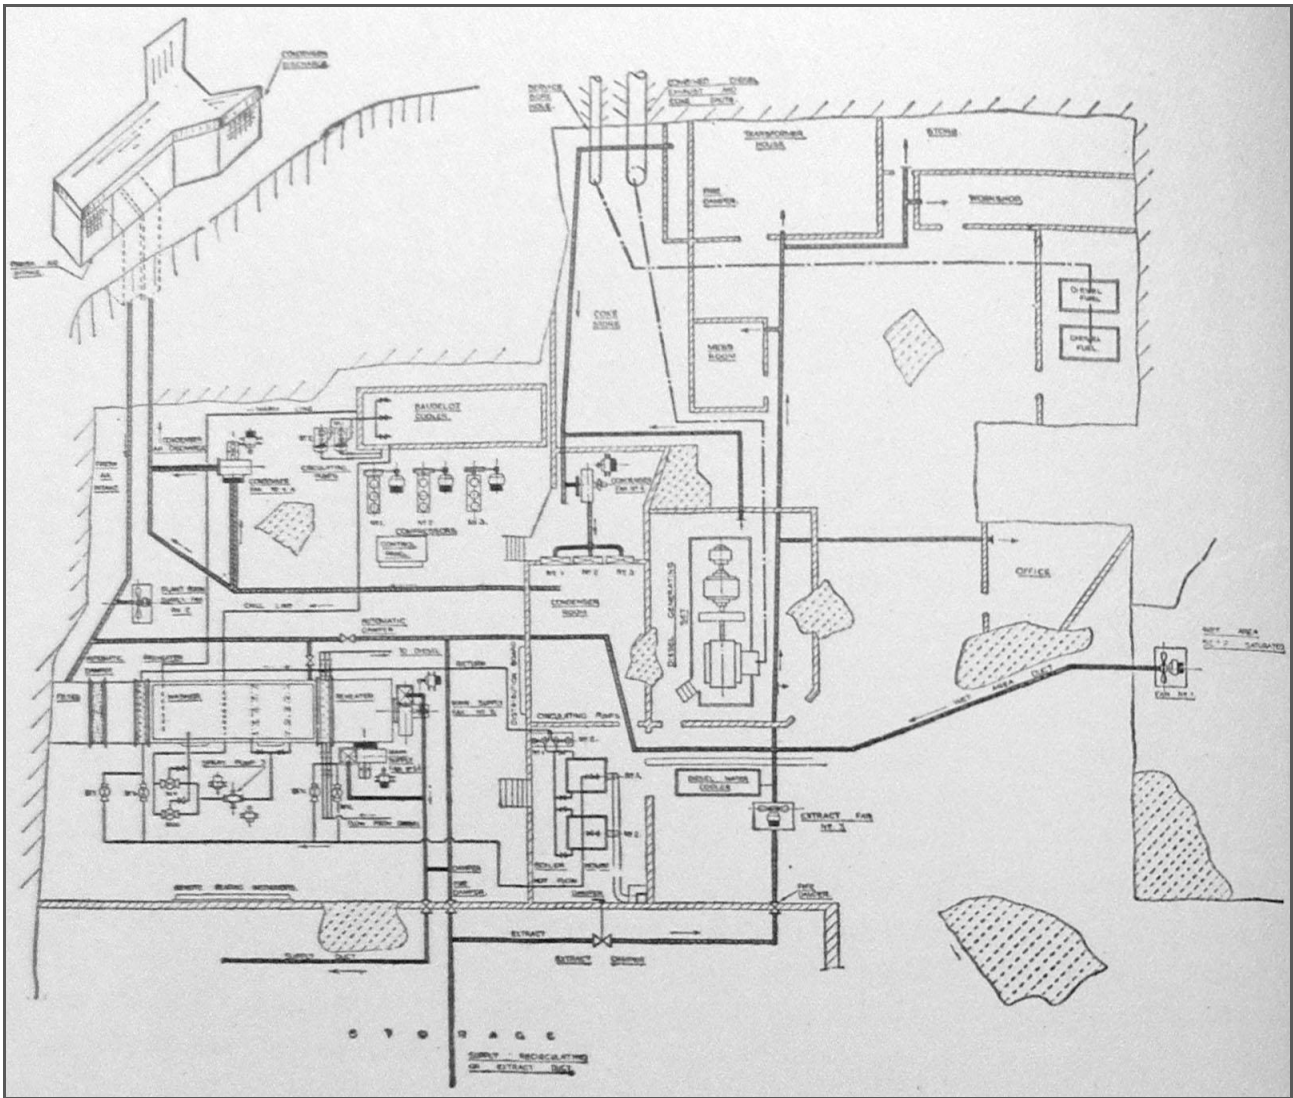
Plan of the building services of the repository in Westwood Quarry
